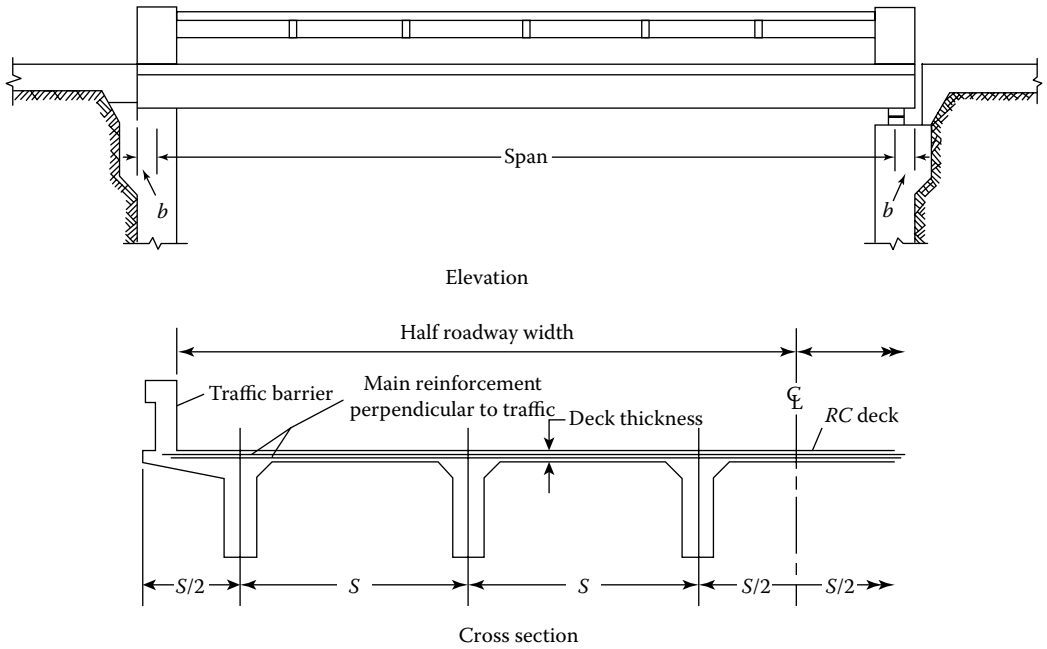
A typical reinforced concrete T-beam bridge. The concrete deck is cast monolithically with the stems. The main reinforcement in the concrete deck slab runs *perpendicular* to the direction of traffic.
